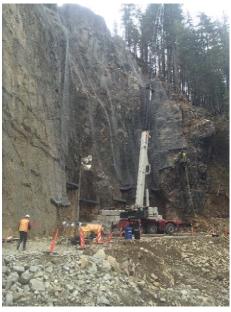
Rock scaling and consolidation work above the future box canal location (May 18, 2016).
